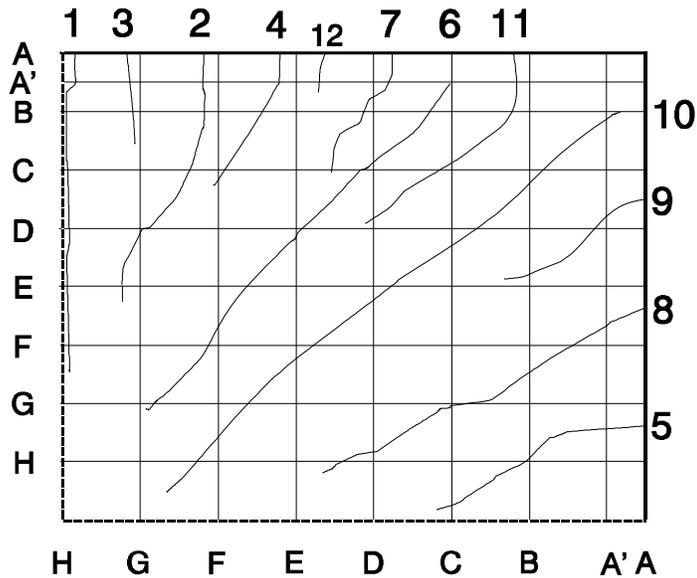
POJ-RC-100-TH cracking pattern on south face of joint at service load
